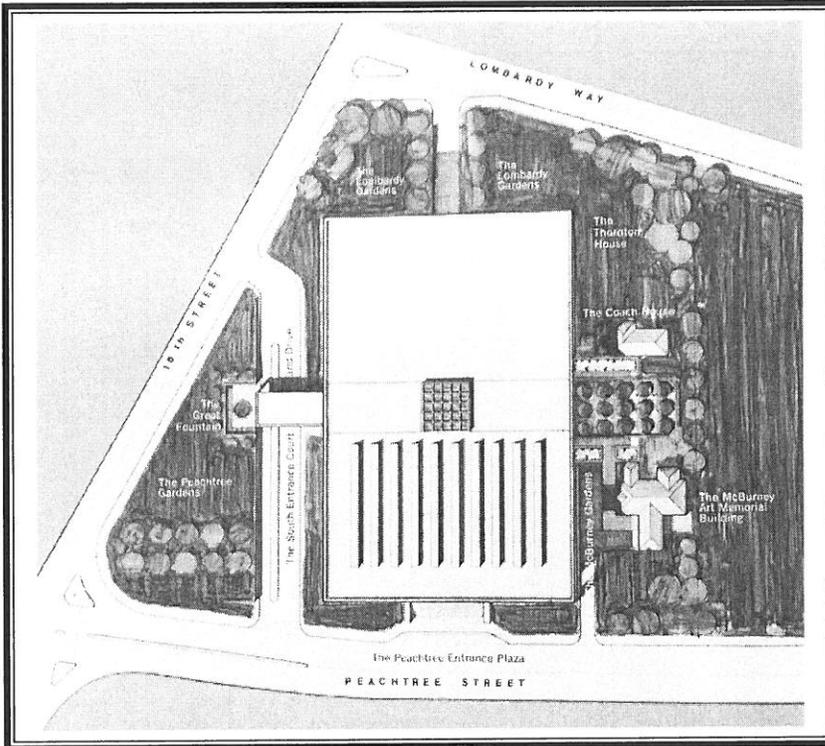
Original site plan of the Woodruff Arts Center, ca. 1968. (from *The Atlanta Memorial Cultural Center*)
